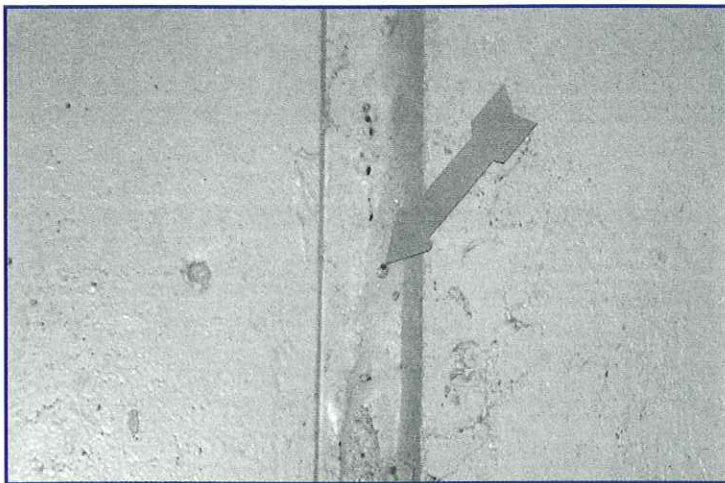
Expansion joint sealant failures resemble a plaza flashing failure.
